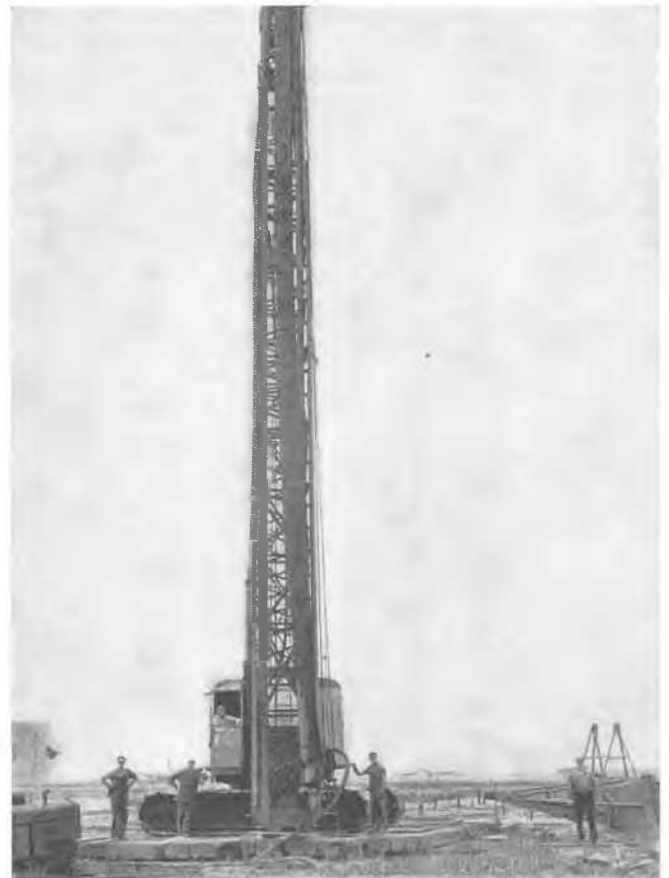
Modified Pile Driving Rig for Installing Sand Drains
